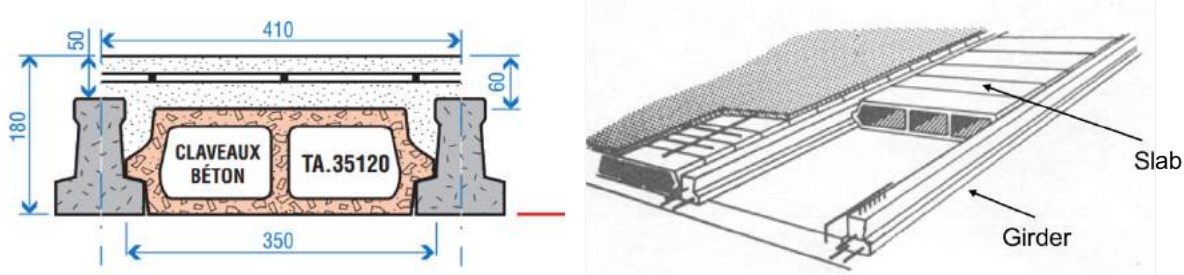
Girder - Slab system and dimensions. [73] [74]
